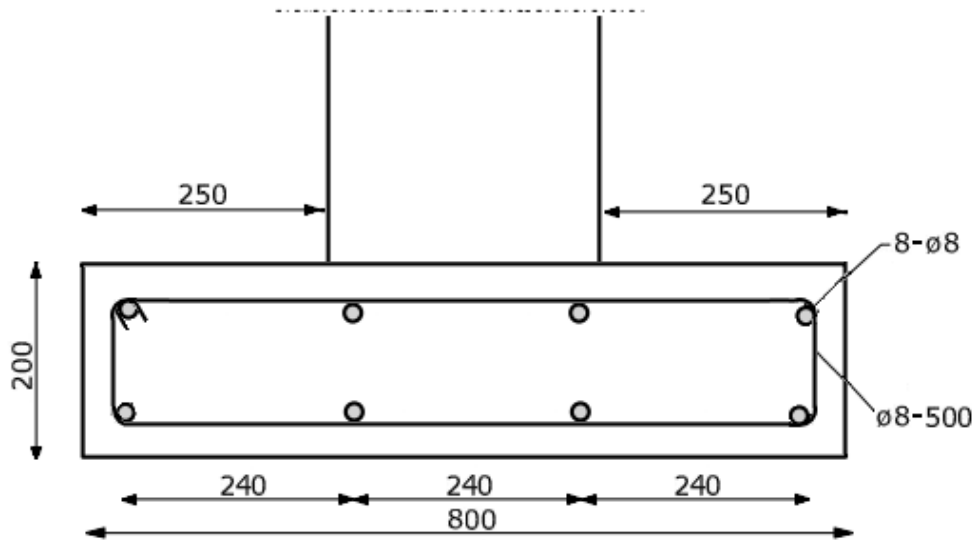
Design and dimensions shallow strip foundation in Zwolle
